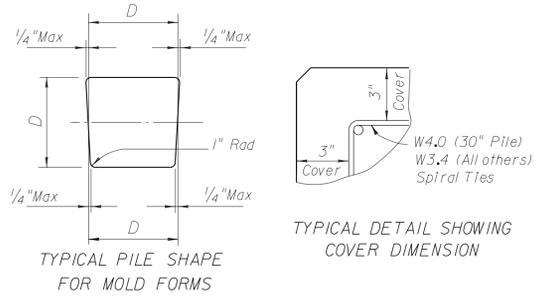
DETAILS FOR REINFORCED PRECAST & PRESTRESSED PRECAST PILE SPLICES
